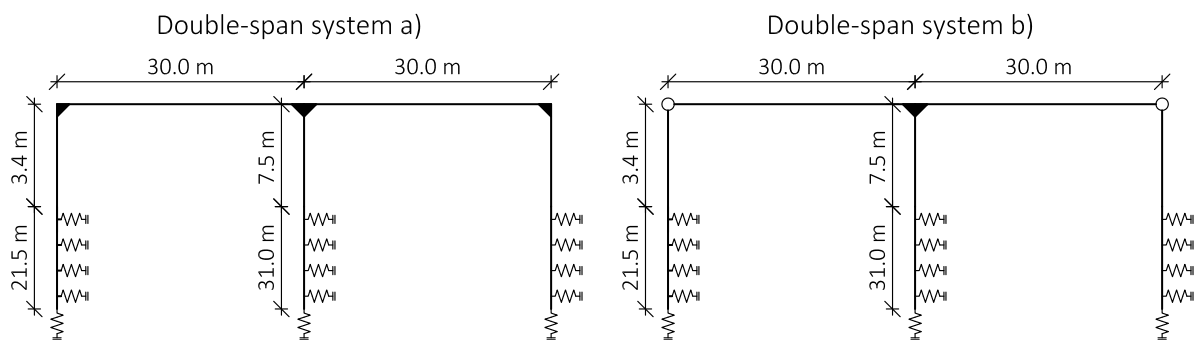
Chosen static systems used for the redesign of the existing L21 Overpass
